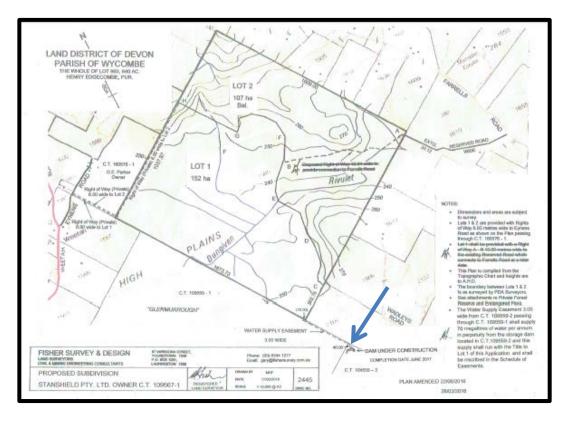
proposed subdivision plan for consideration. Arrow showing location of subject dam.
